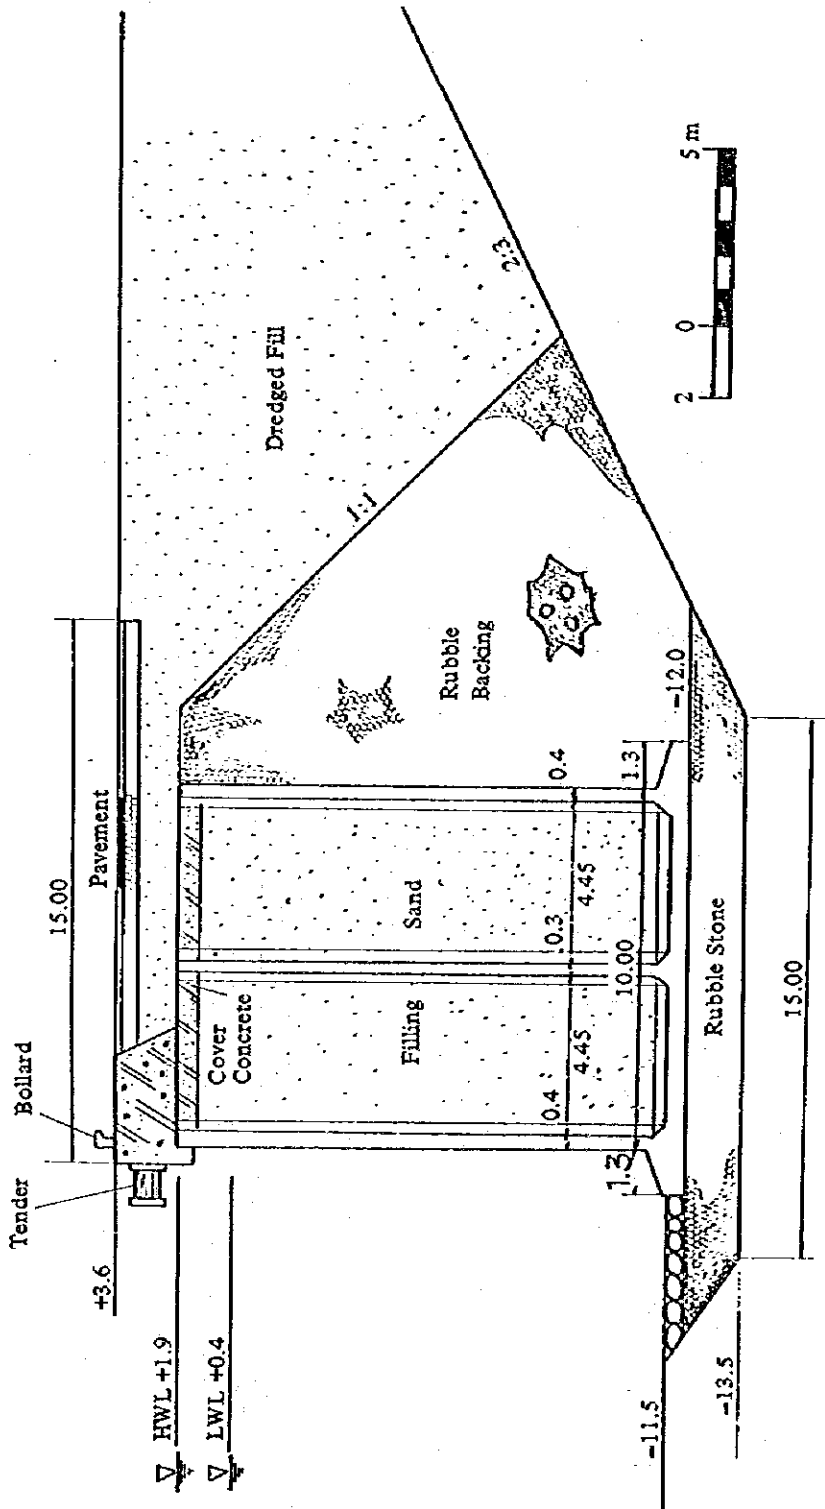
Section of Concrete Caisson for Bulk Cargo,
